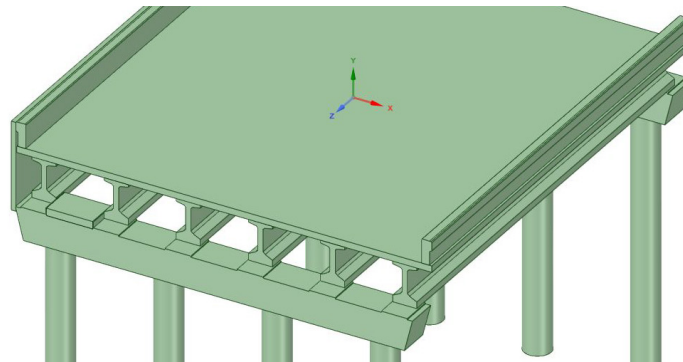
I-girder bridge with flat plate debris (elevation)
